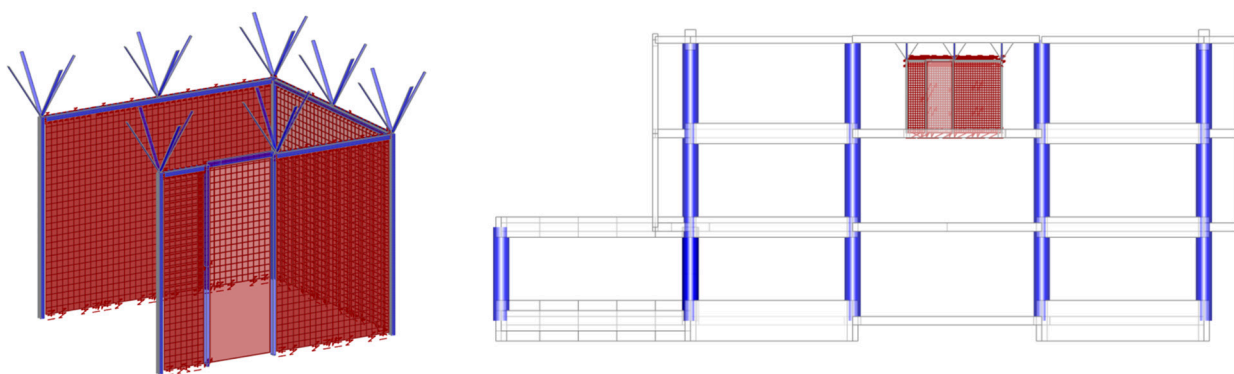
FEM of the system connection to the upper floor through 3D steel bracing elements (assumed and modelled as 3 mm × 40 mm steel braces with pinned connections).
